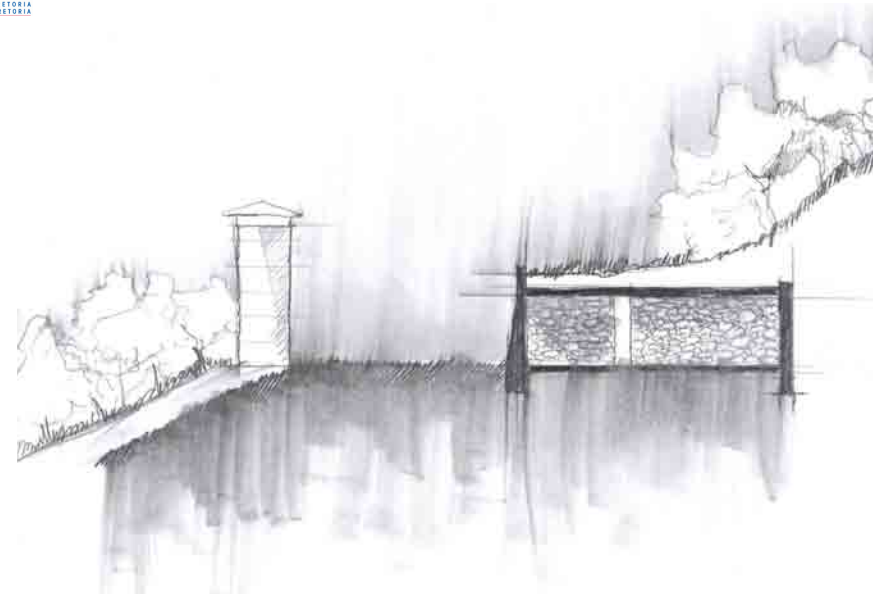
Conceptual sketch of Red Magazine section (Author, 2011)
